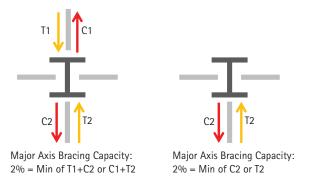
,b Four-sided and three-sided lateral bracing comparison (T=tension capacity of girder-to-column connection, C=compression capacity of girder-to-column connection)
